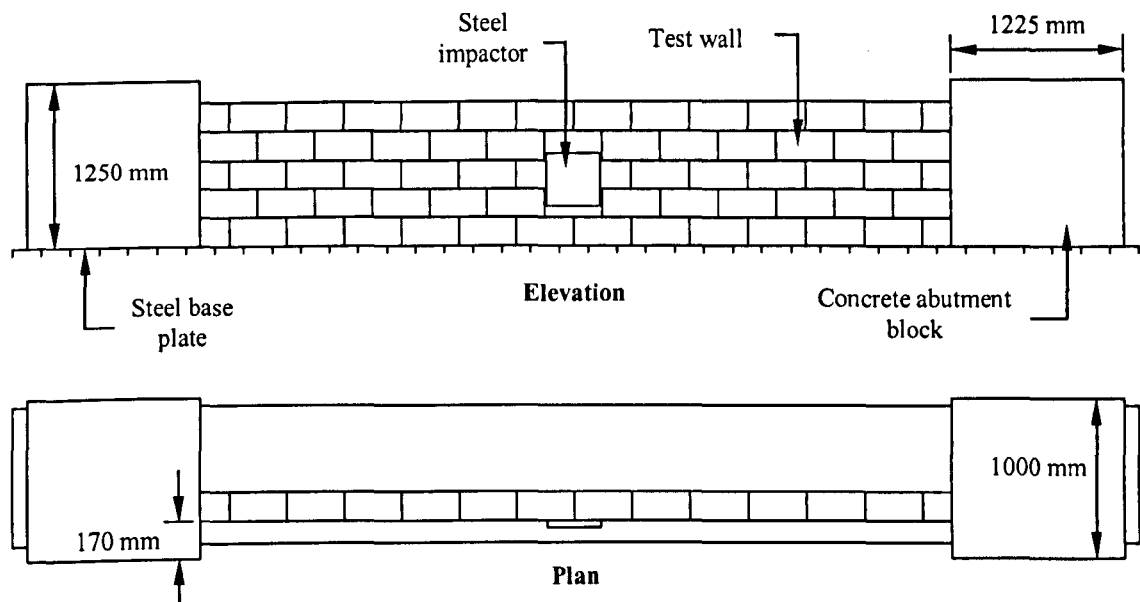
Test arrangement showing position and dimensions of concrete abutment blocks
